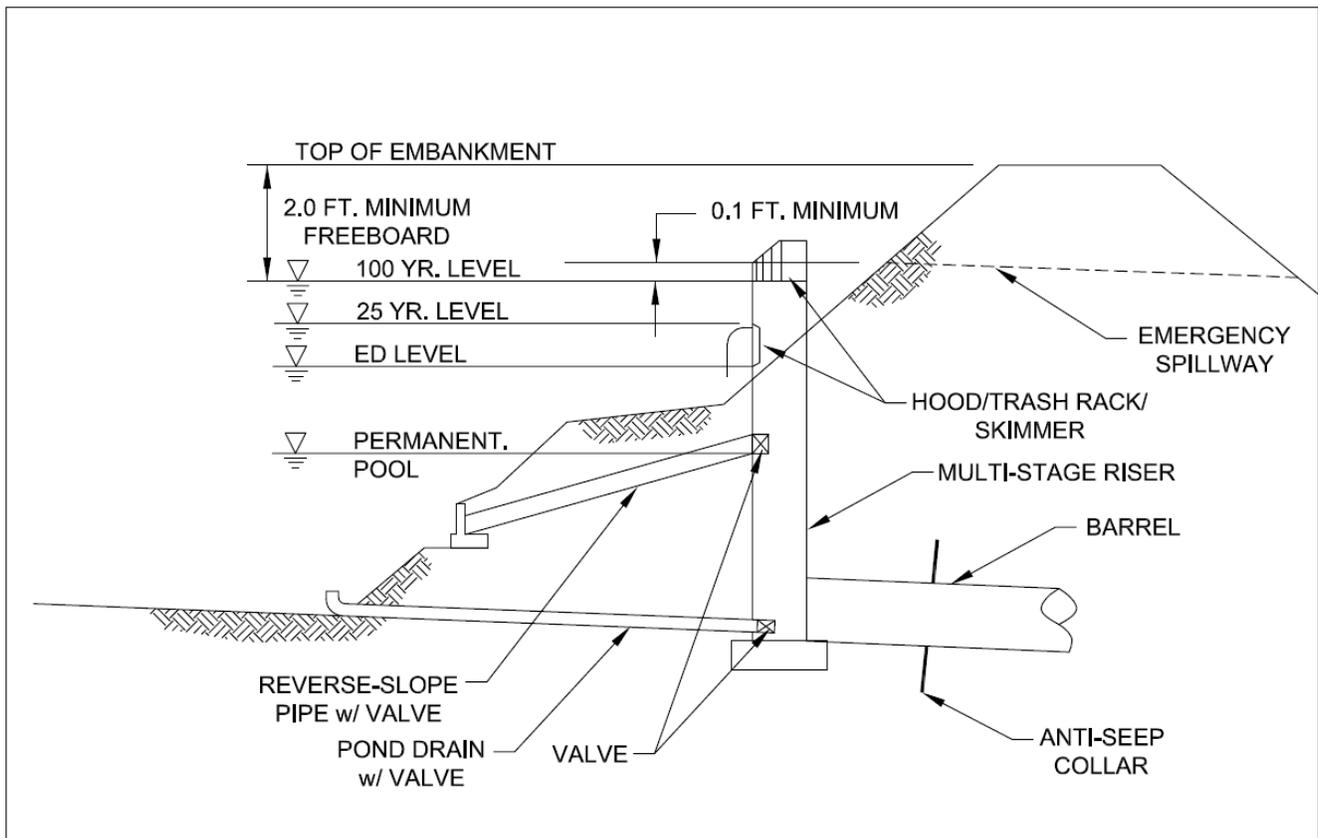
Stormwater Pond Cross-Section with Benches
